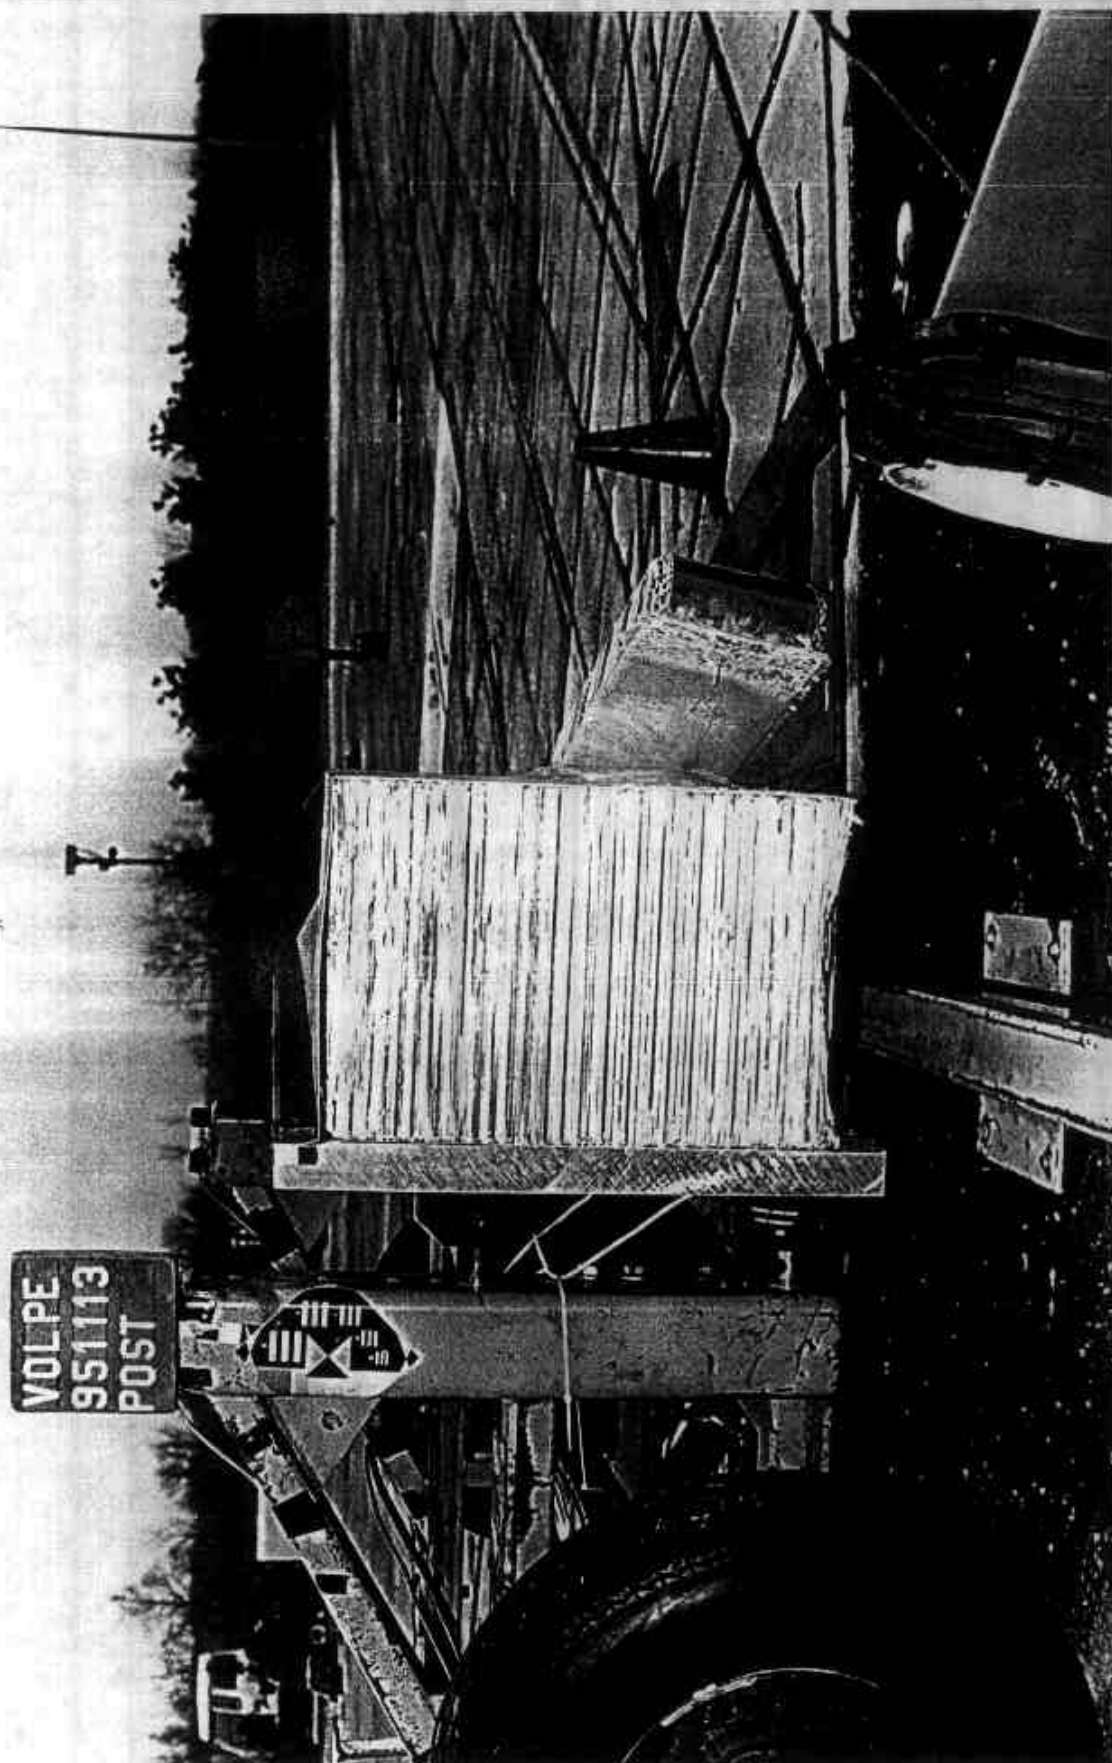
Post-Test Barrier Face Deformation View - Right Side
